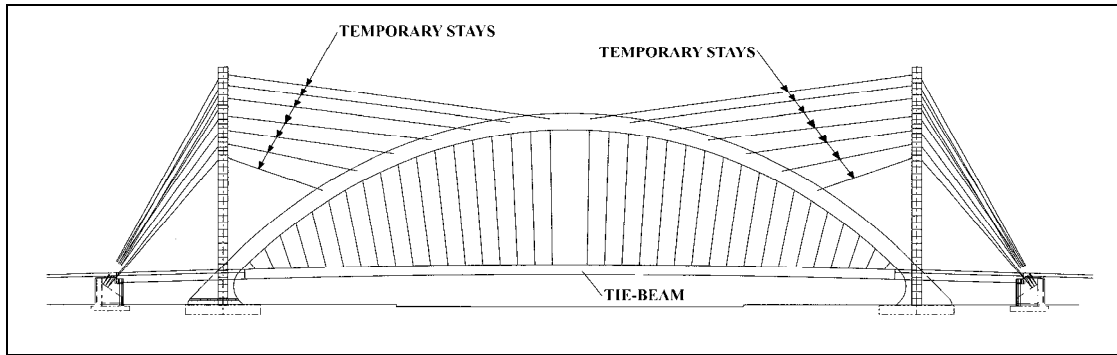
Step 5-Complete the Tie-Beam (Modified IRIB Specifications and Construction Plans)
